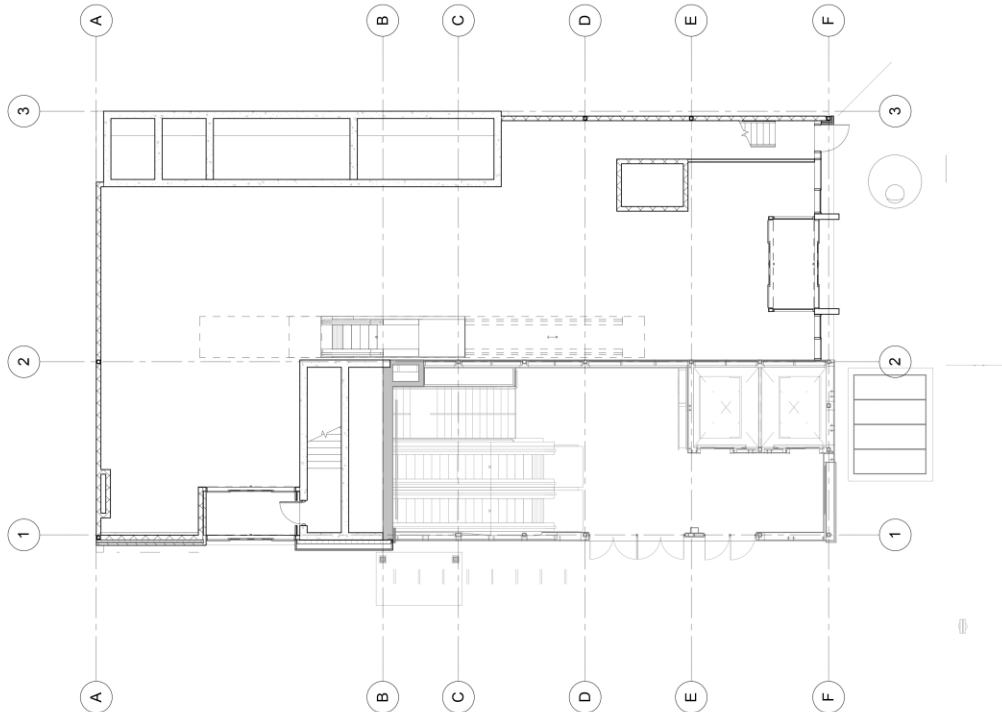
Ground floor plan for proposed infill building at 117 Rideau St. (Source: IBI Group, 2016)
